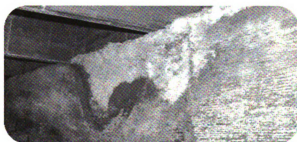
Formation of Efflorescence on a Concrete Surface
